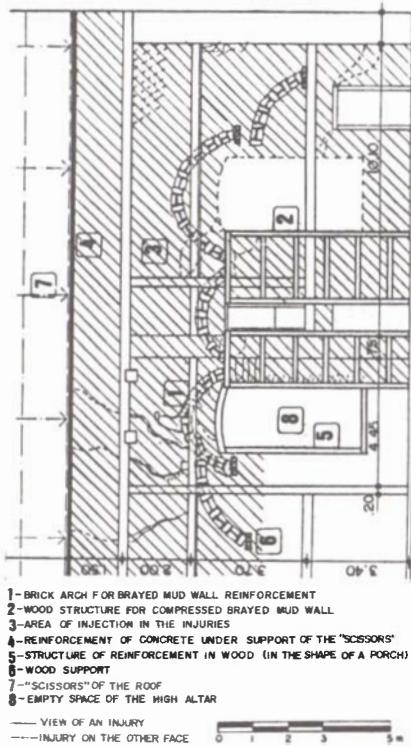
Brayed mud wall reinforcement proposal. Illustration by Lima.
